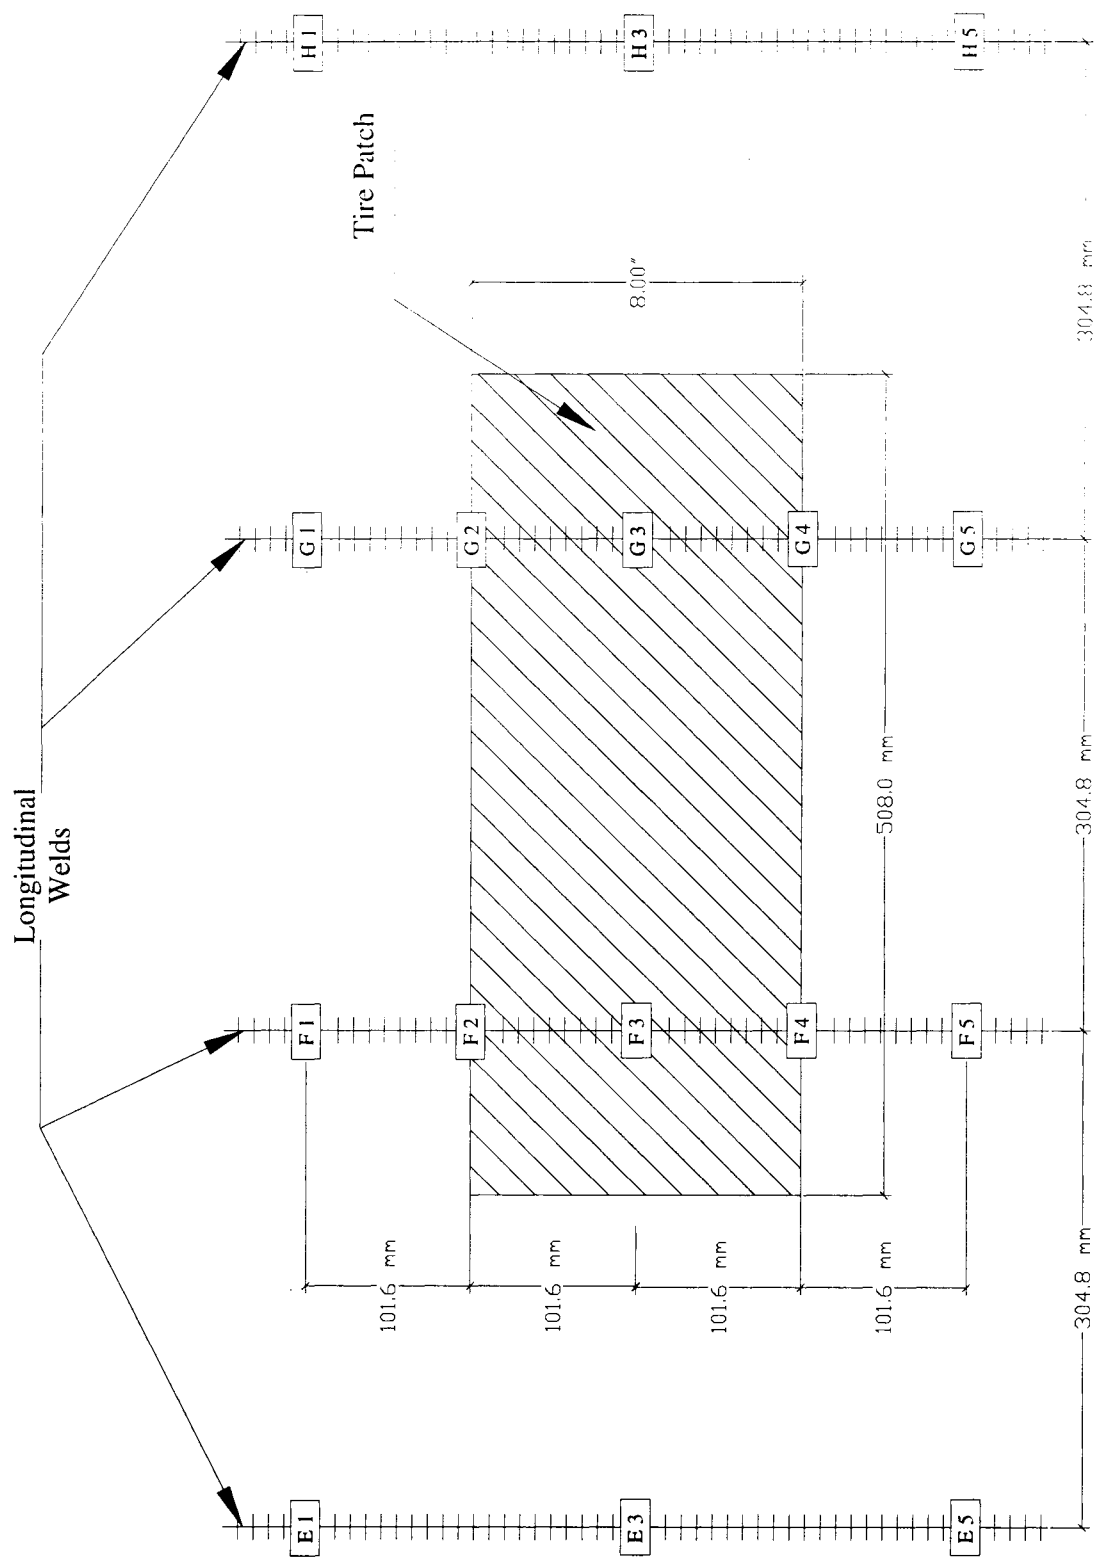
Fatigue Test 2 Gage Layout, Bottom of Side A
